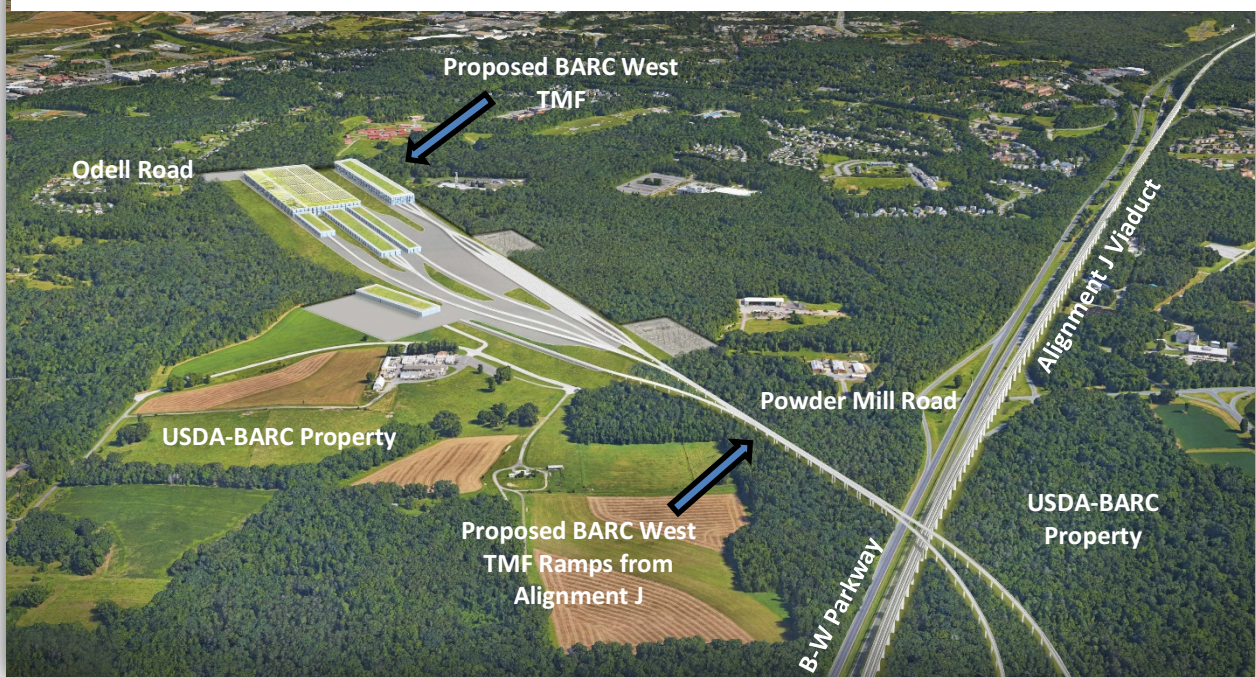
CAAs #5, #6, and #8 AFTER: Illustrative Rendering of Proposed BARC West TMF with and Corresponding Ramps with Alignment J, Looking North
